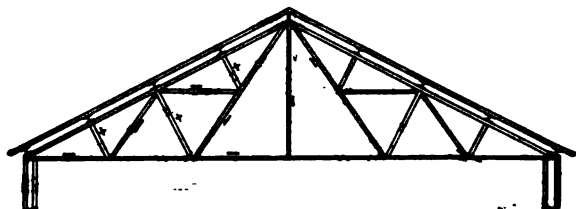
Fink Truss. Spans from Forty to Eighty Feet
